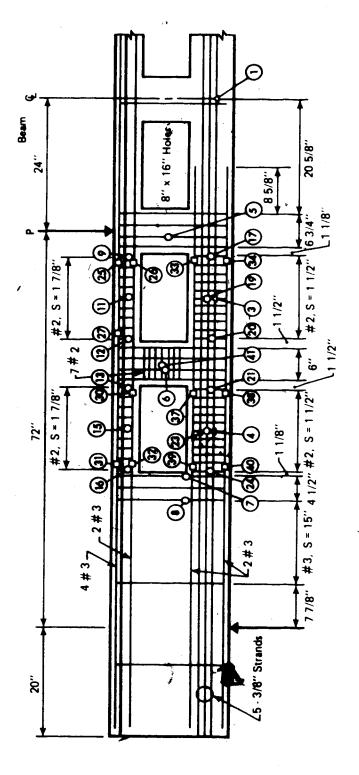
Reinforcement Details and Strain Gage Locations for Beam 19-16-6
